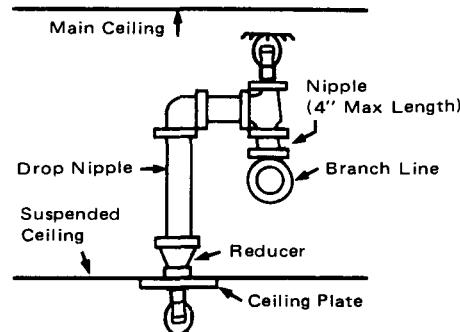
(b) Sprinklers in concealed space and below ceiling.
